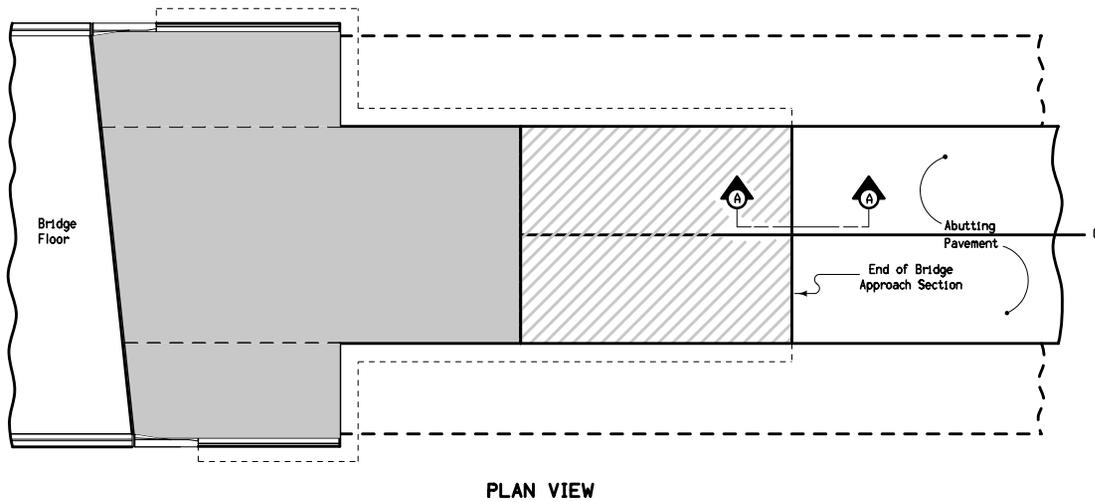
Detail A: Paving contractor (of bridge approach pavement) to pave additional pavement (as shown) and construct 'C' Joint at end of bridge approach section. Leave in this state.
